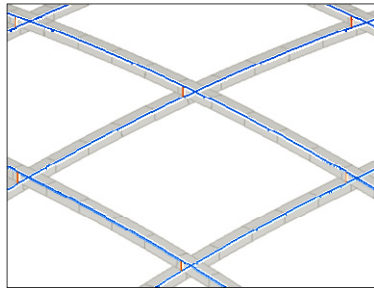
Custom section properties for 'pin' beam connector elements between timber lath layers.
